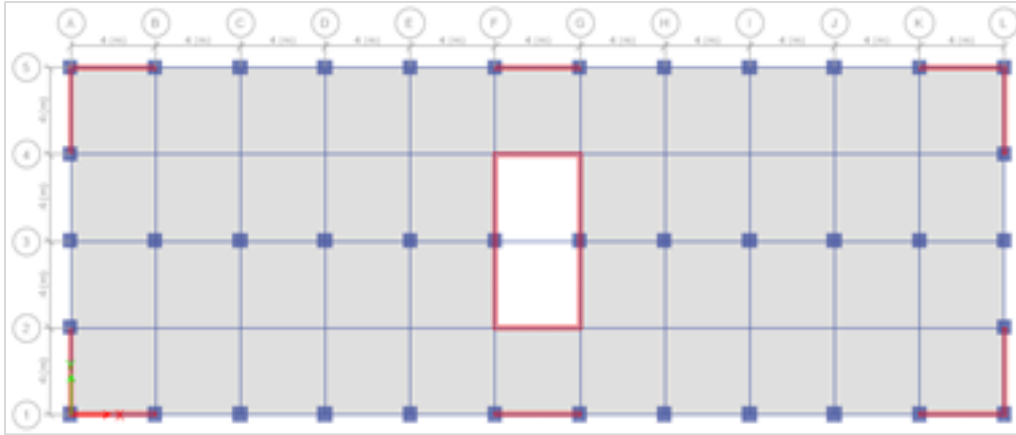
Plan of framed tube structure with shear wall at core, corners and side
